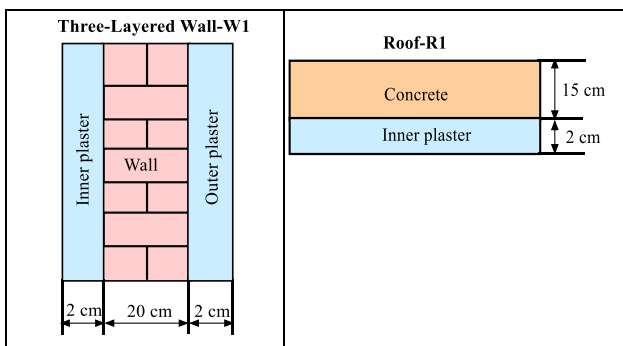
Schematic presentation of a multilayer wall/roof construction.
